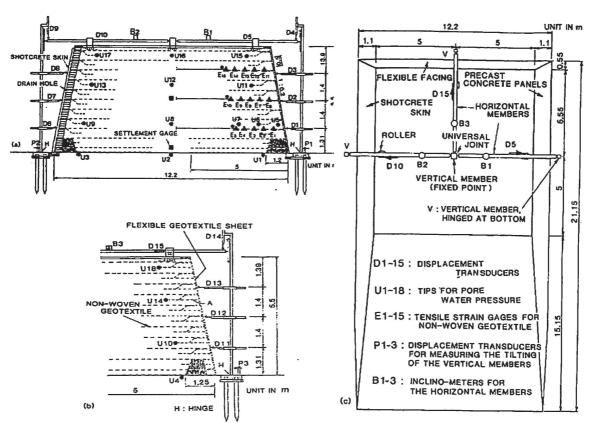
Initial cross-sections of; a) left-hand and right-hand walls; and b) backside wall; and c) plan of Chiba test embankment No. 3.
